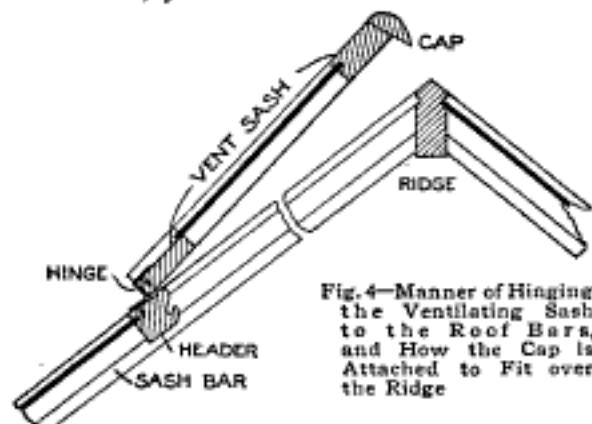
Manner of Hinging the Ventilating Sash to the Roof Bars, and How the Cap is Attached to Fit over the Ridge
